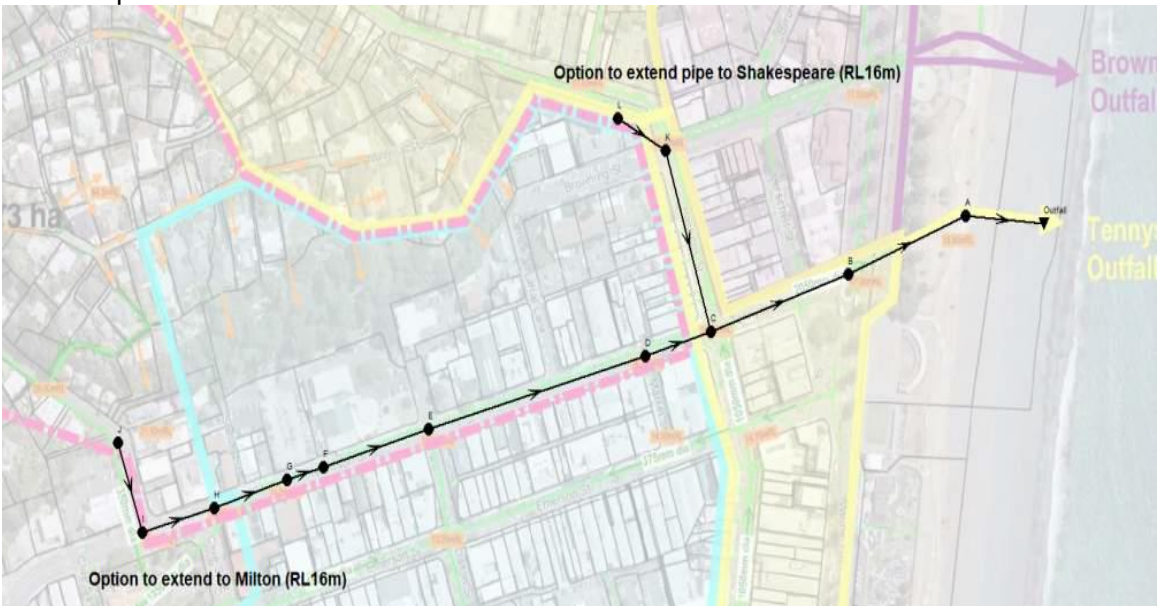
Concept for pressurised gravity to discharge out new elevated pipe
